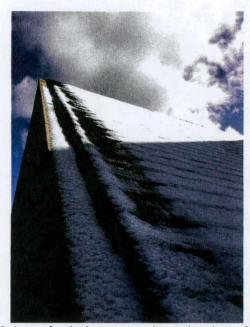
Areas of melted snow were observed on the roof rake and eave locations of the roof, these are locations that gaps in the insulation were observed.
